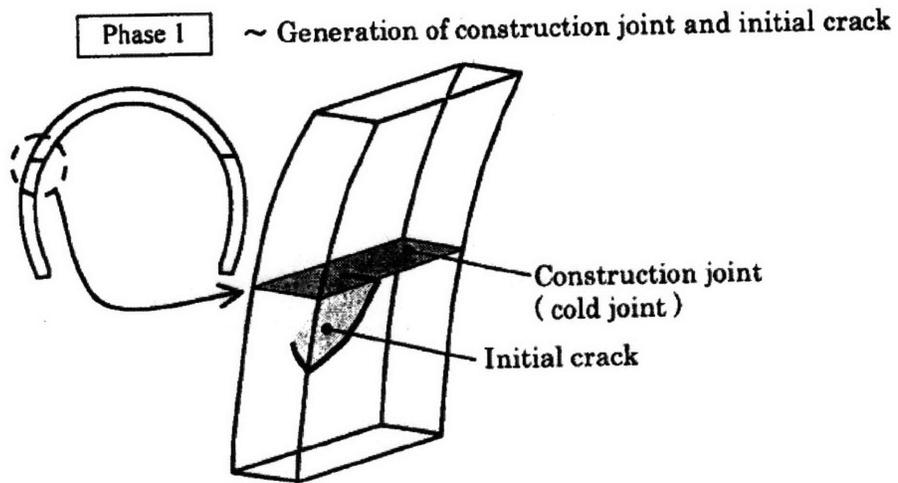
, Mechanics of Spalling in the Fukuoka Tunnel, (Asakura et al. 2001)
